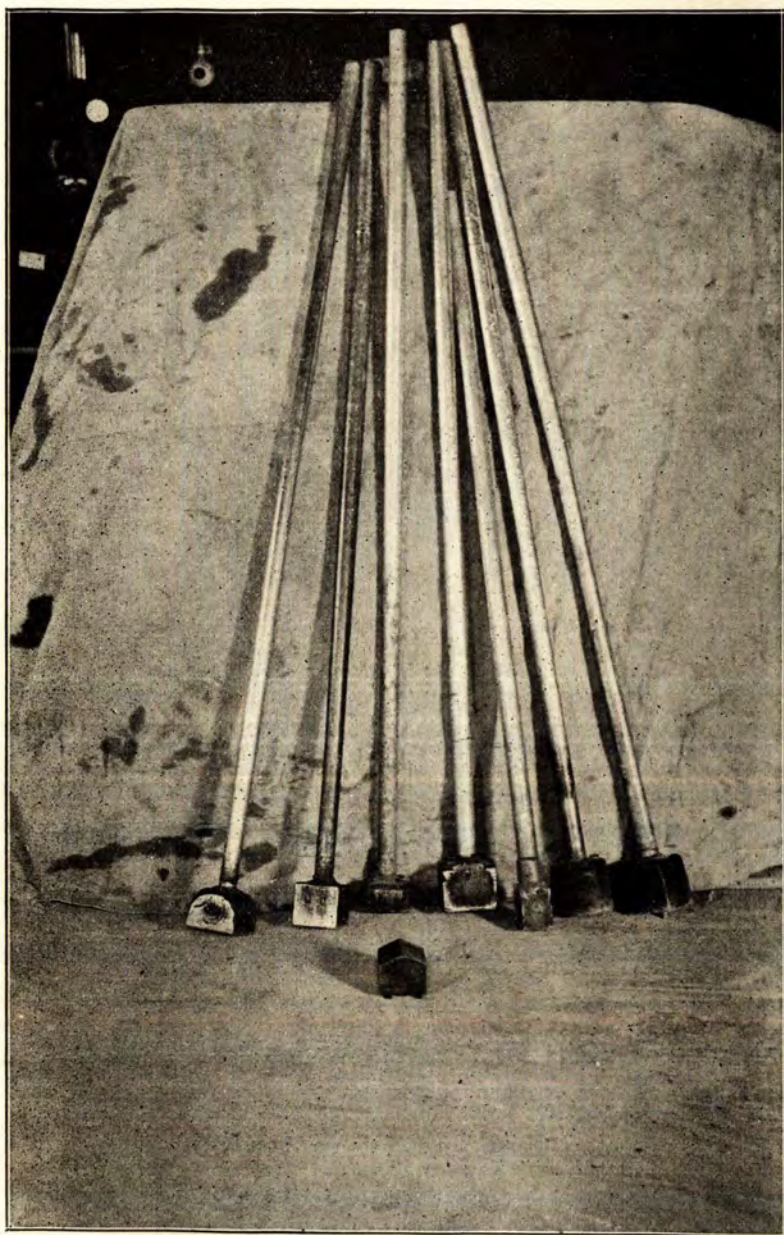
A COLLECTION OF HAND RAMMERS USED IN BUILDING RAMMED EARTH WALLS.
